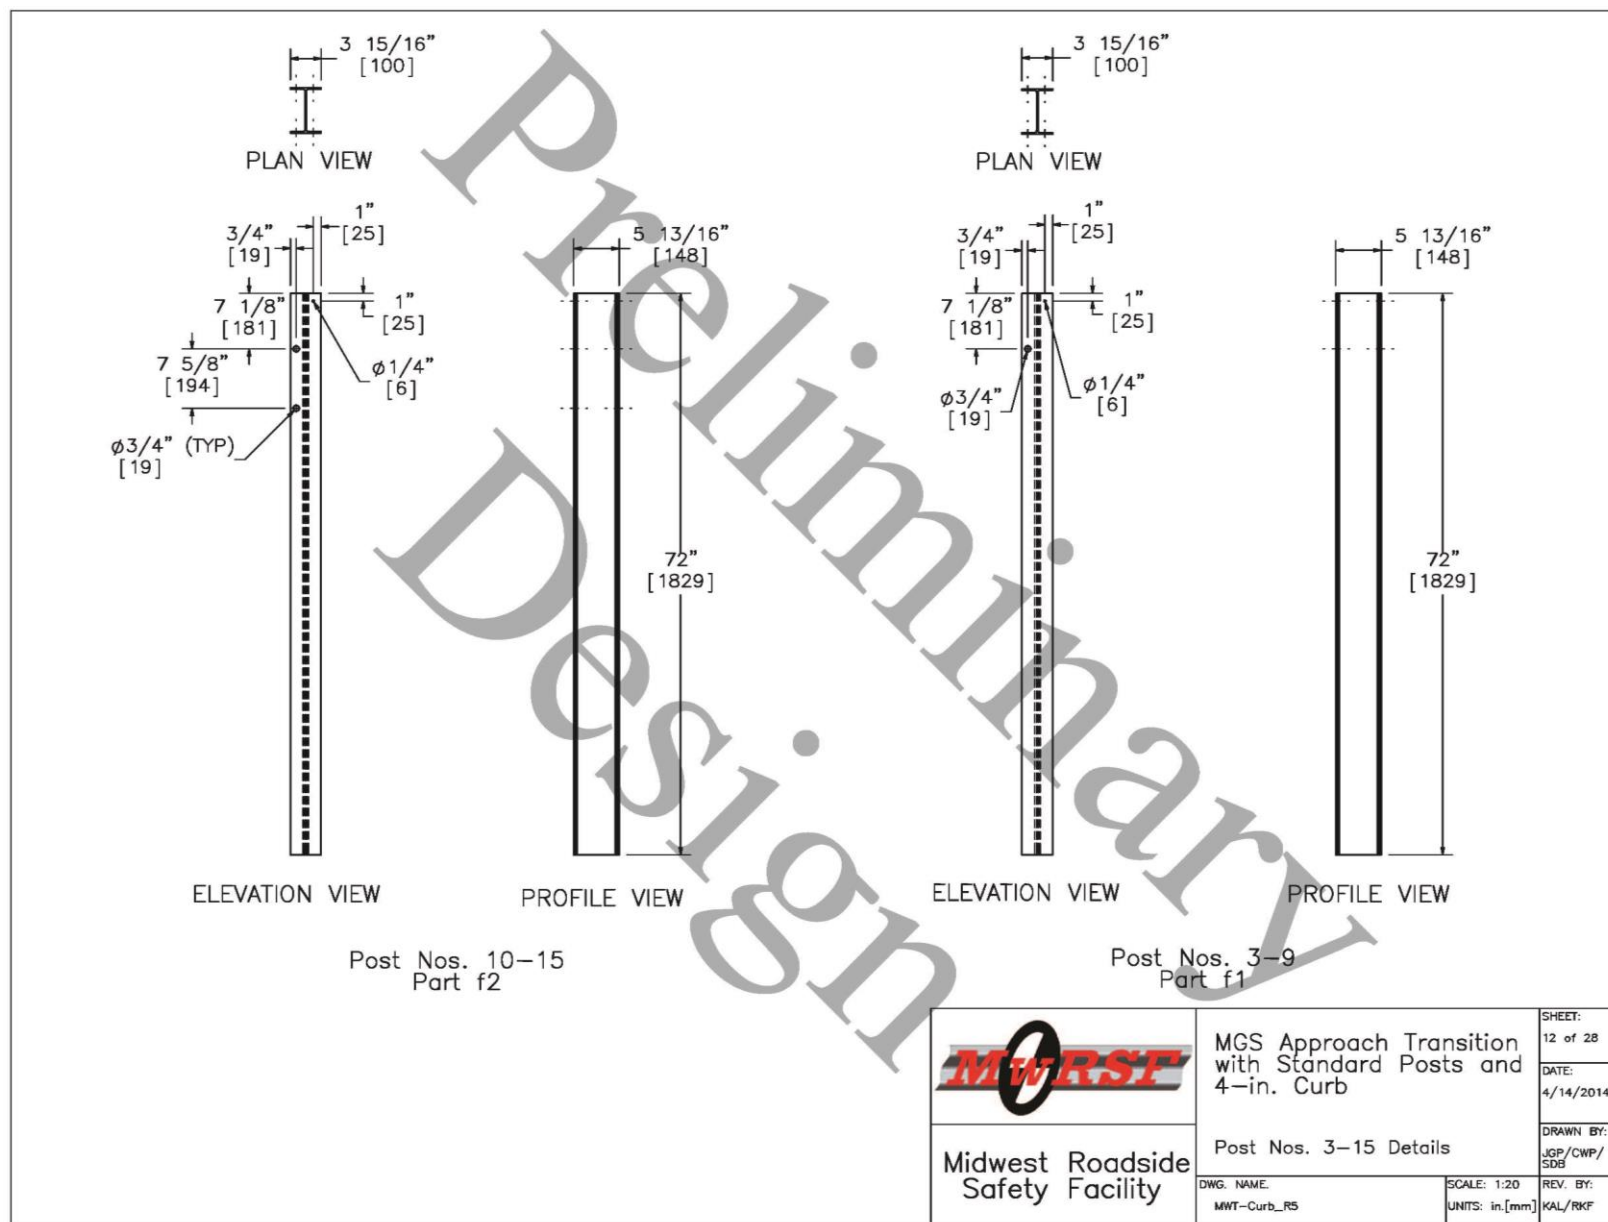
Post Nos. 3 through 15 Details, Test No. MWTC-1
